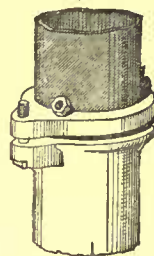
Perspective View of Lead Connection with Flanged Pipe.
